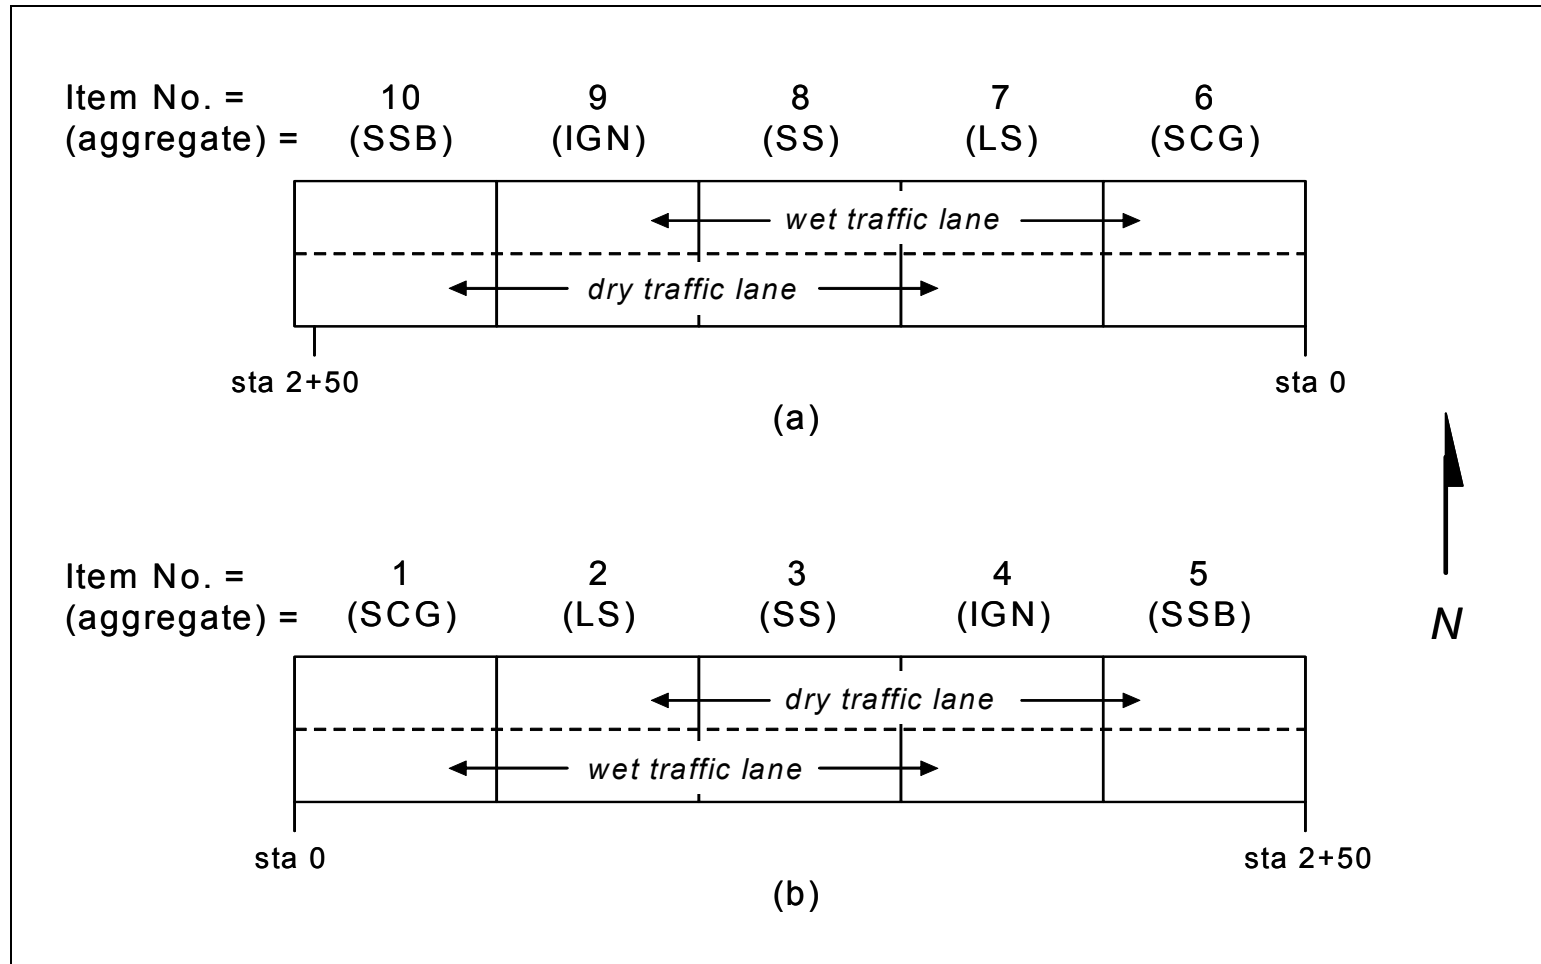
Test item layout for the (a) construction and (b) maintenance test sections
